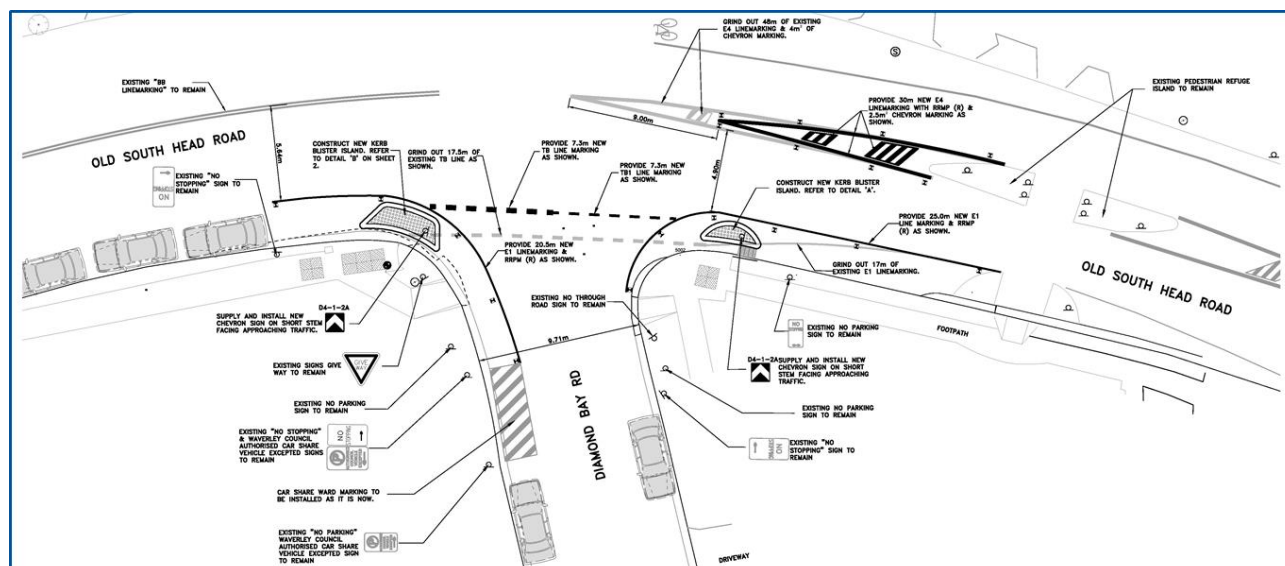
Existing arrangements at Old South Head Road and Diamond Bay Road
